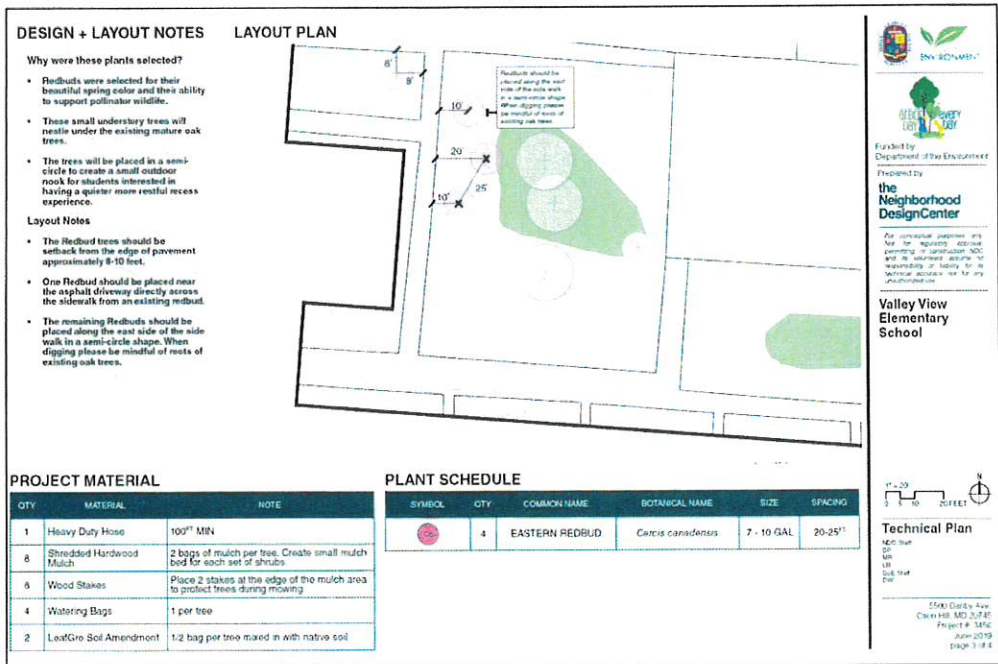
Valley View Elementary Layout and Post-Planting Notes
